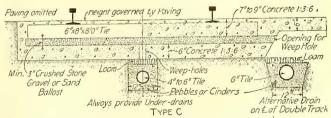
TYPE C—CONCRETE SLAB SUB-BALLAST TRACK
